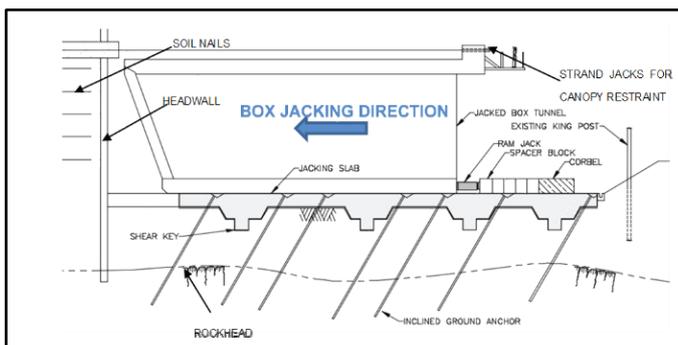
Typical Arrangement of Jacked Boxes on Jacking Slab
